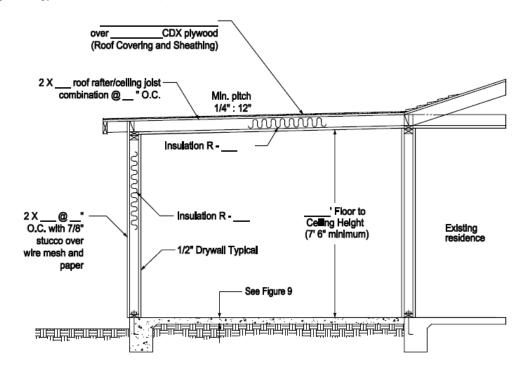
Typical Cross Section View, Slab Floor with Vaulted Celling
